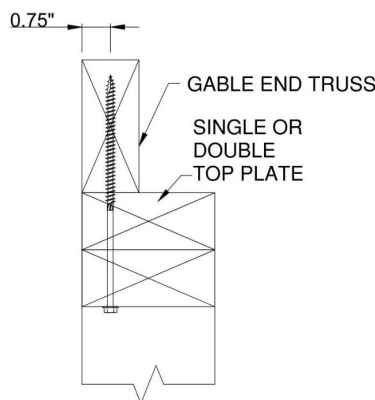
GABLE END TRUSS TO TOP PLATE INSTALLATION CONFIGURATION
